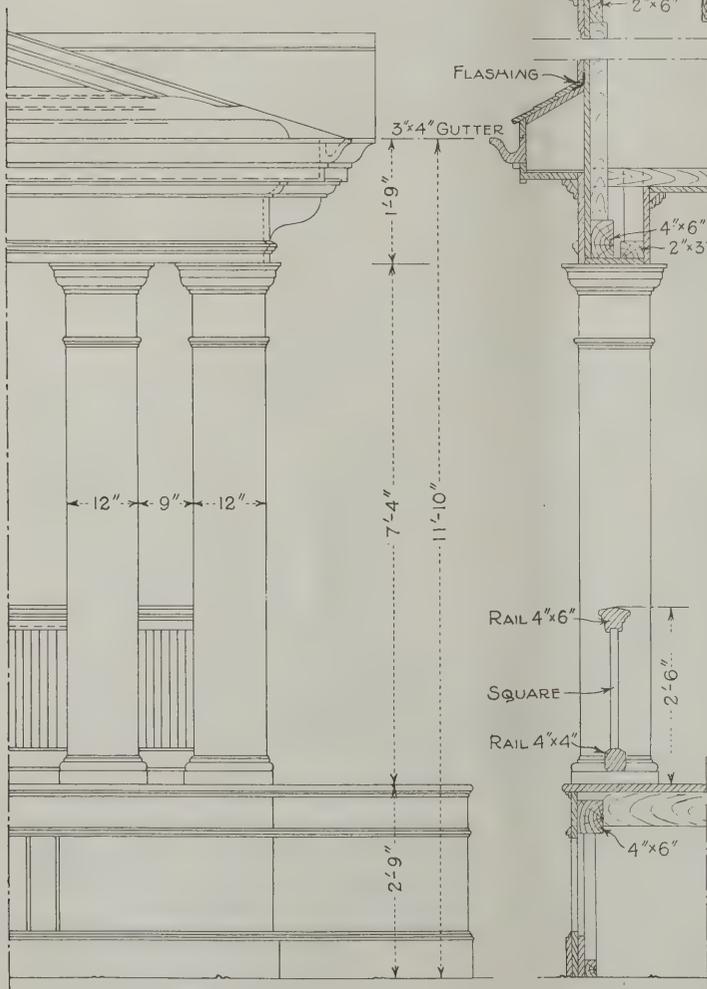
Elevation and Section of Front Porch—Scale 3/8 in. to the Foot
